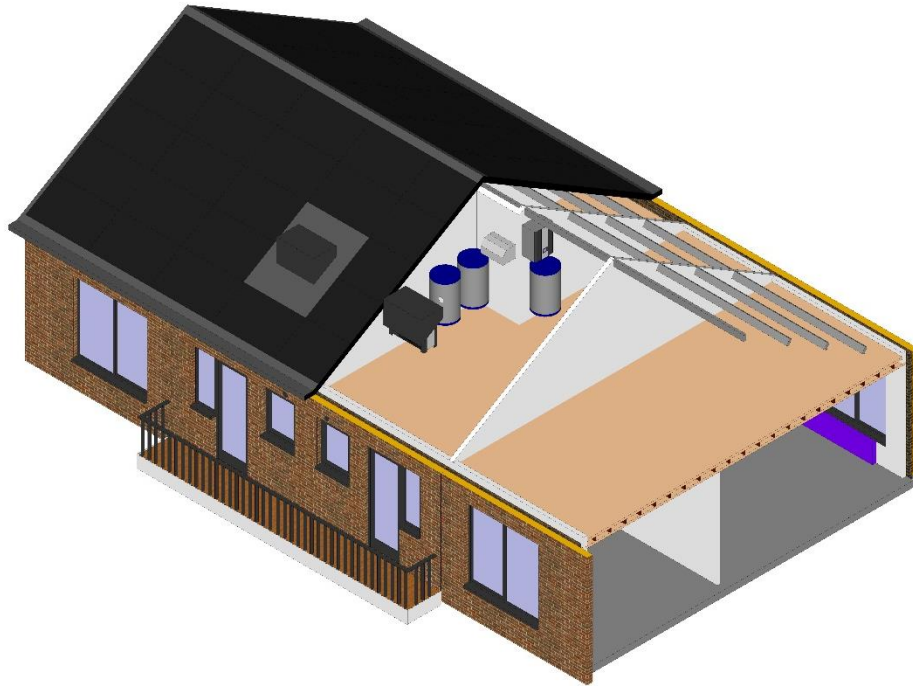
Section building Final design with building services on the attic, Source: own illustration.
